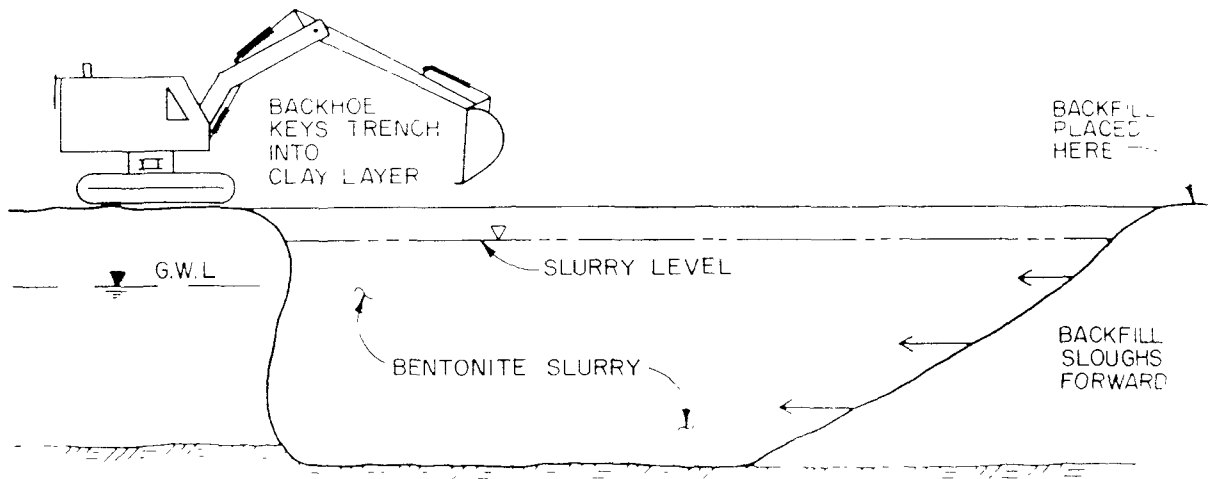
Schematic of SB slurry wall installation process [Ryan, 1980].
